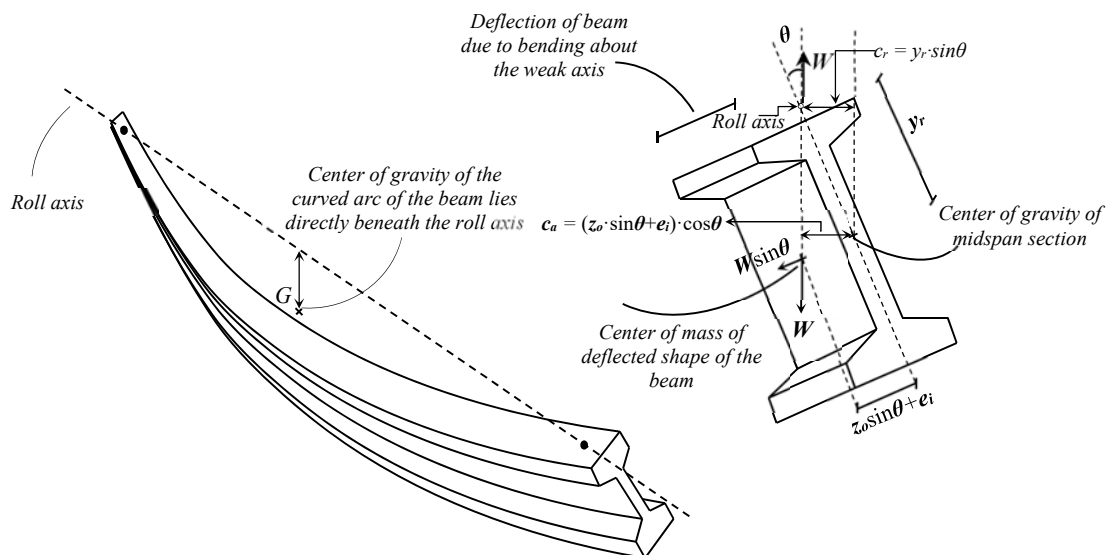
Final equilibrium position of a hanging girder [adapted from Mast, 1989]
